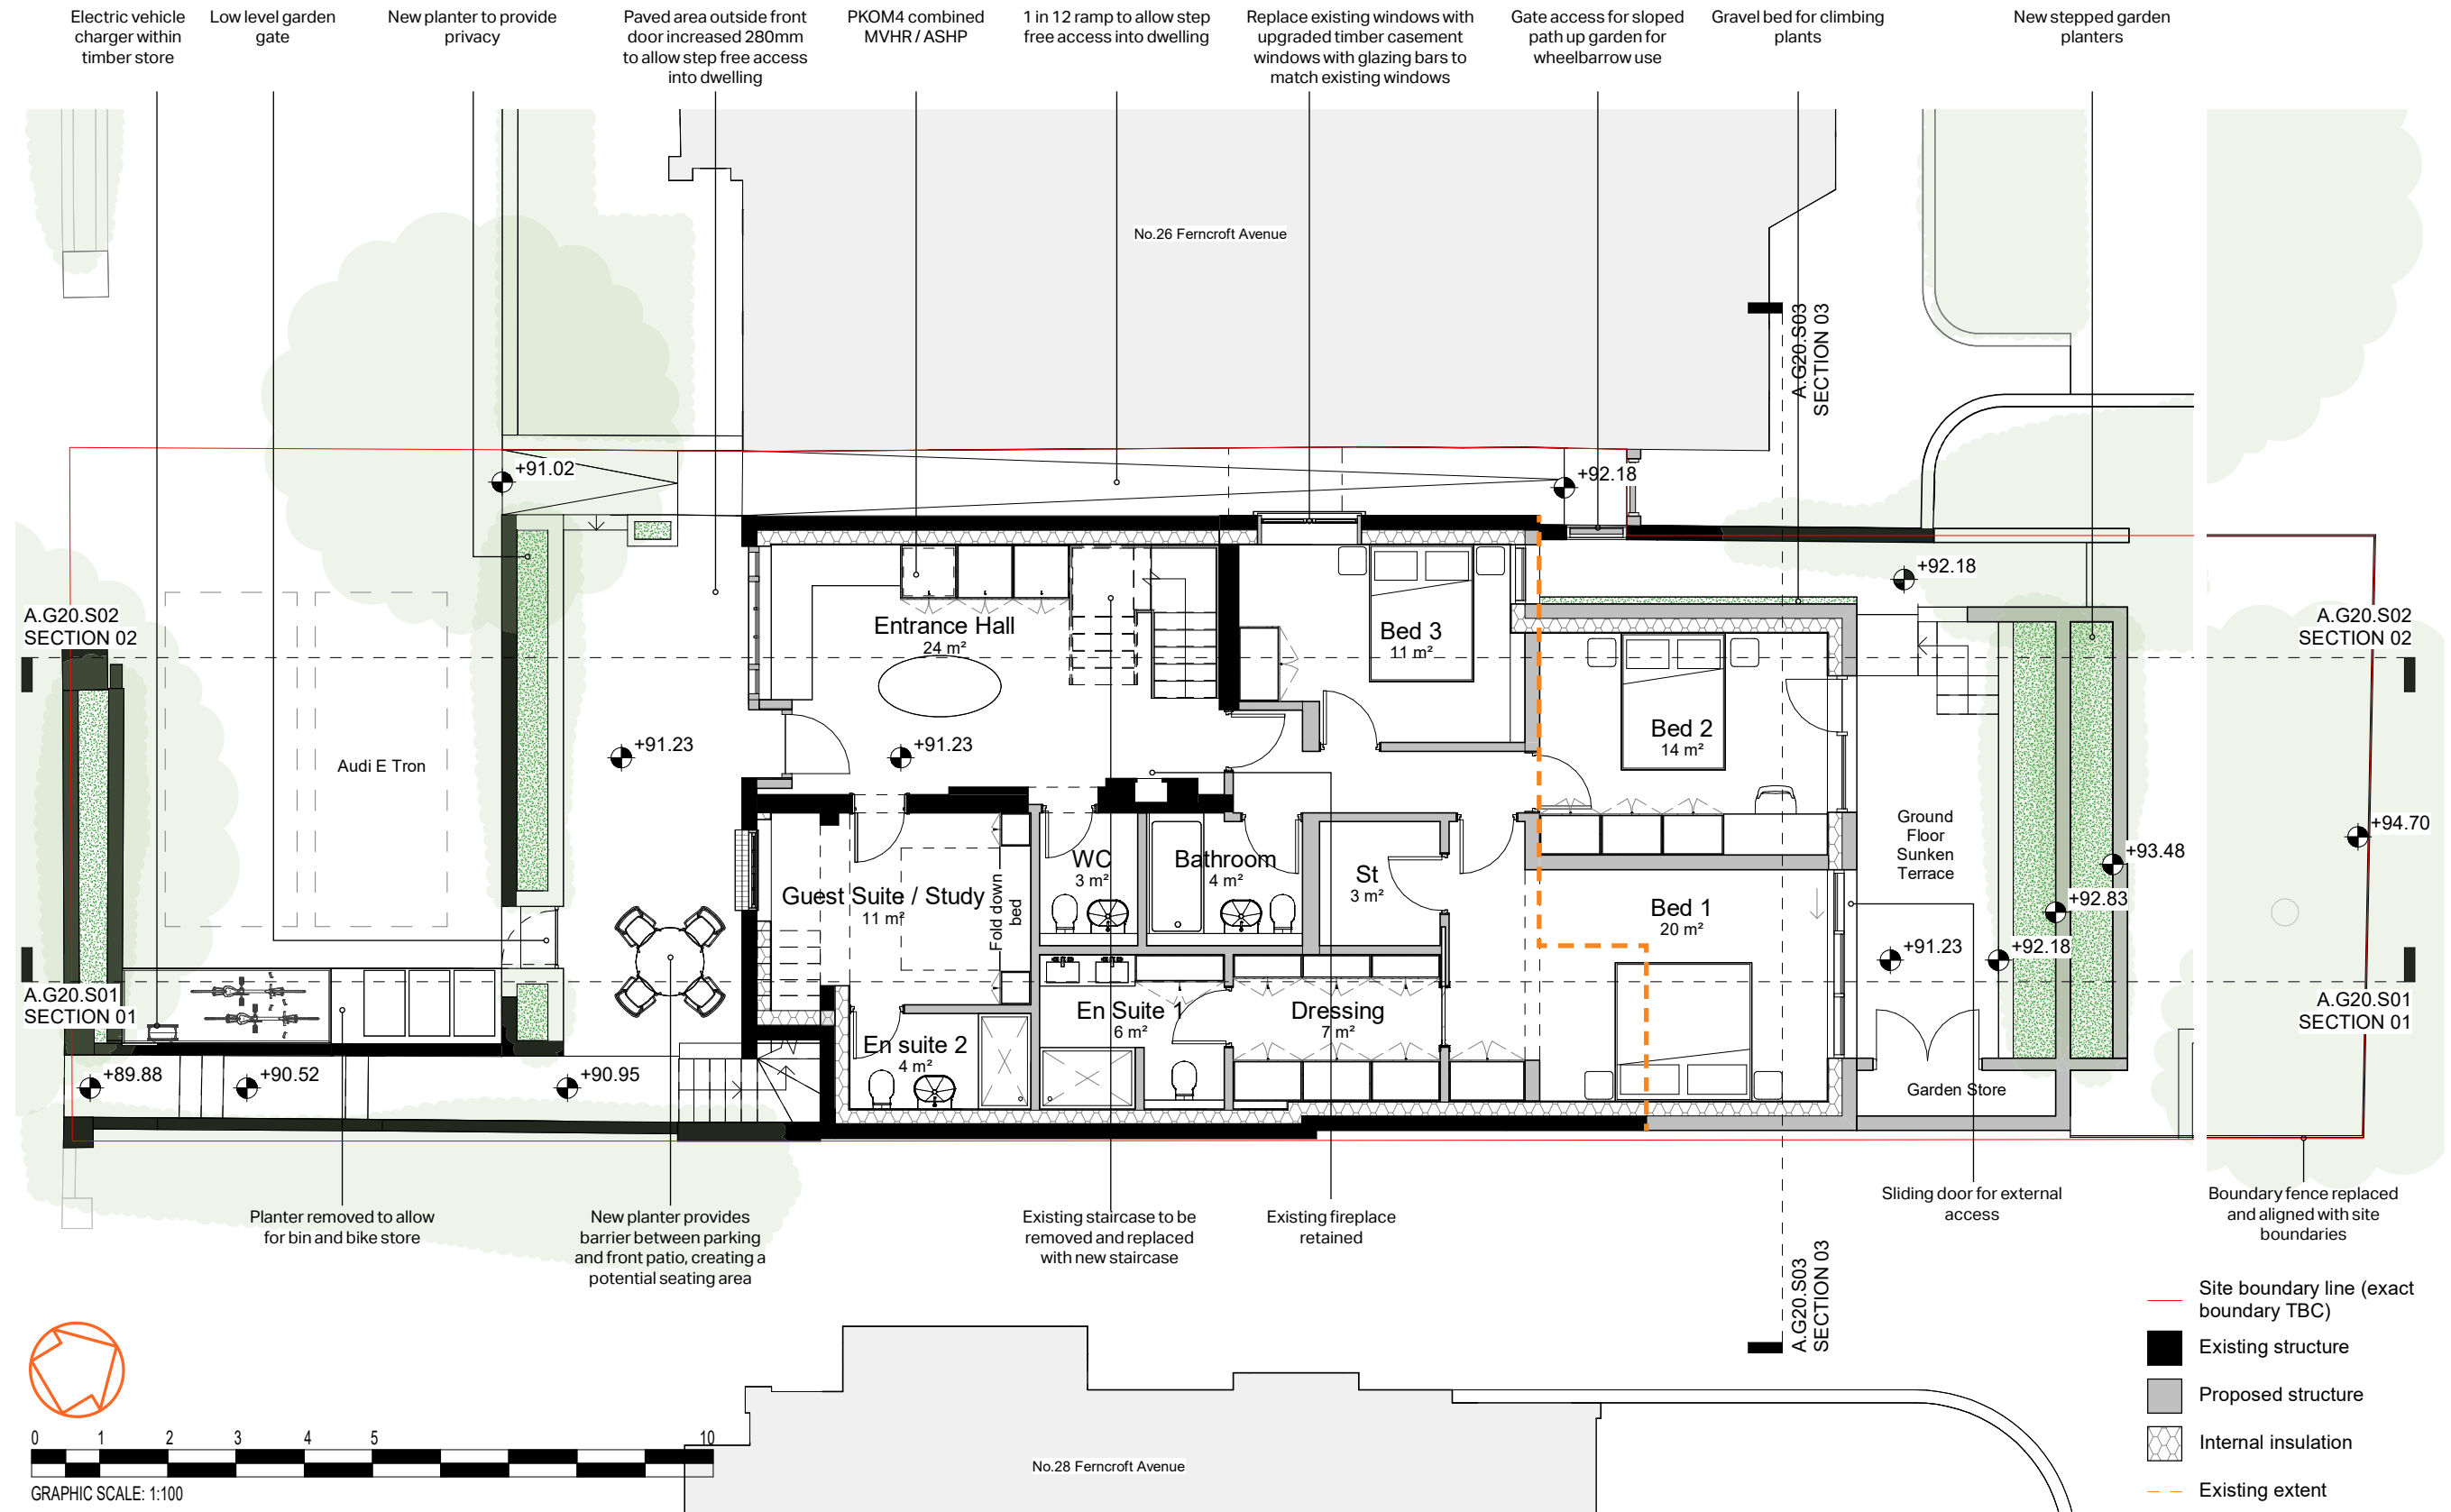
Proposed Ground Floor Plan 1:100 @ A3
